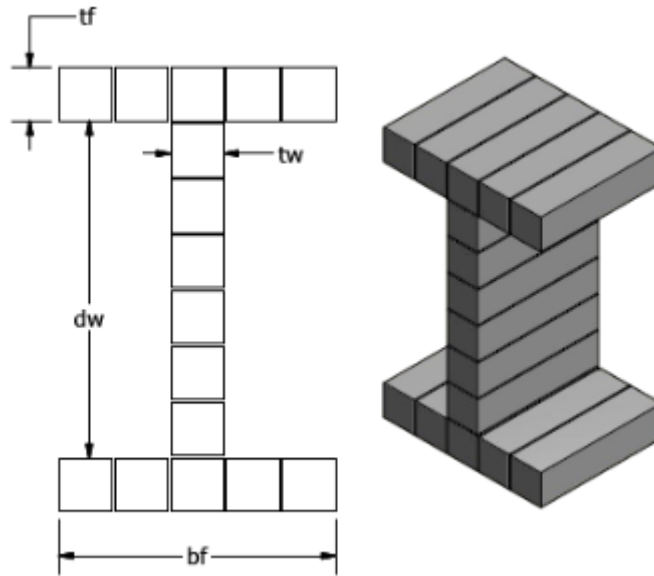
Beams and columns cross-section fibres discretization in OpenSees
